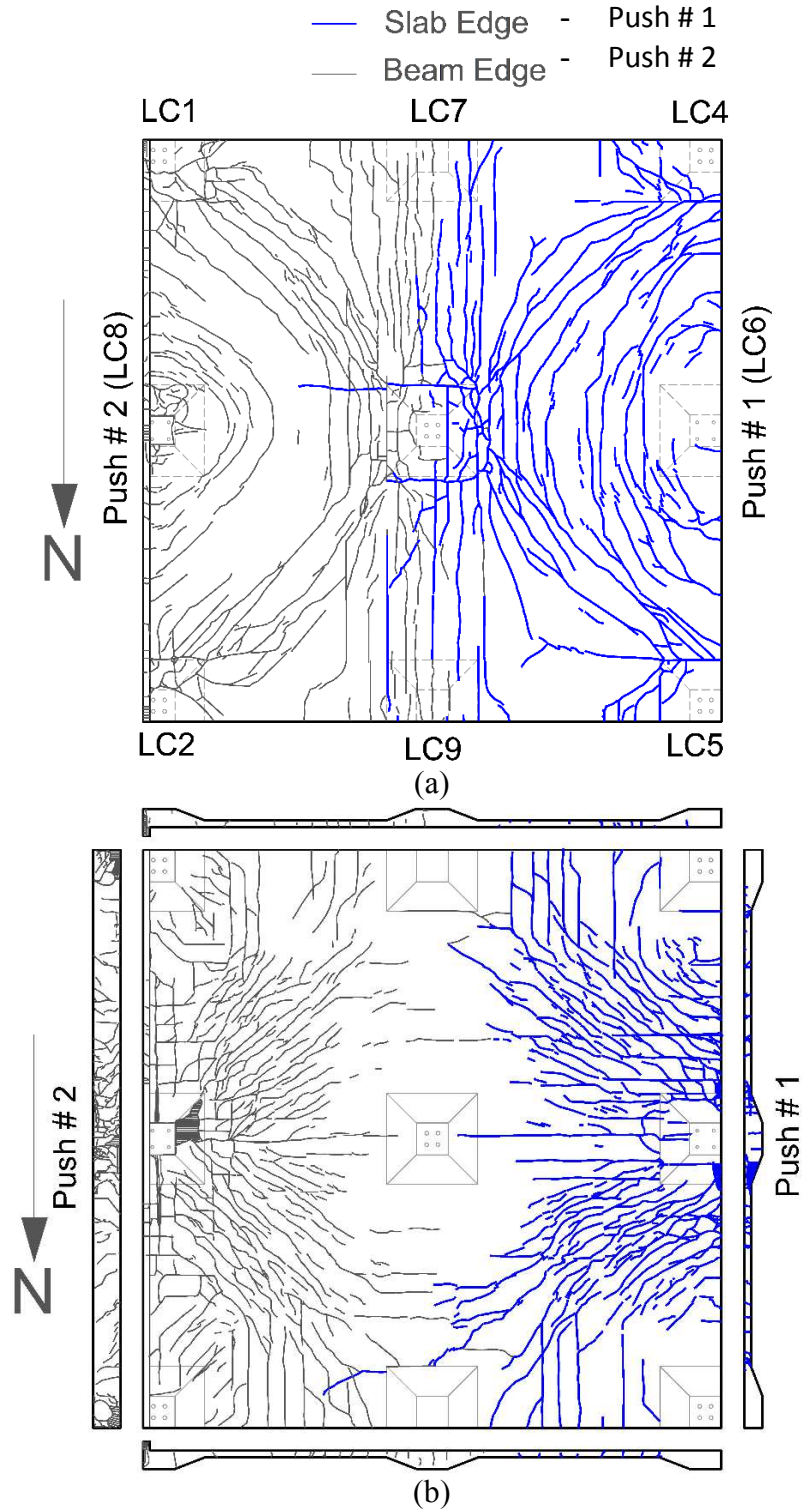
Schematic of the observed damage on the specimen at the end of push tests on specimen 2, (a) cracks on top surface of the specimen at the end of the test, and (b) cracks observed on bottom surface and sides of the specimen at end of the test.
